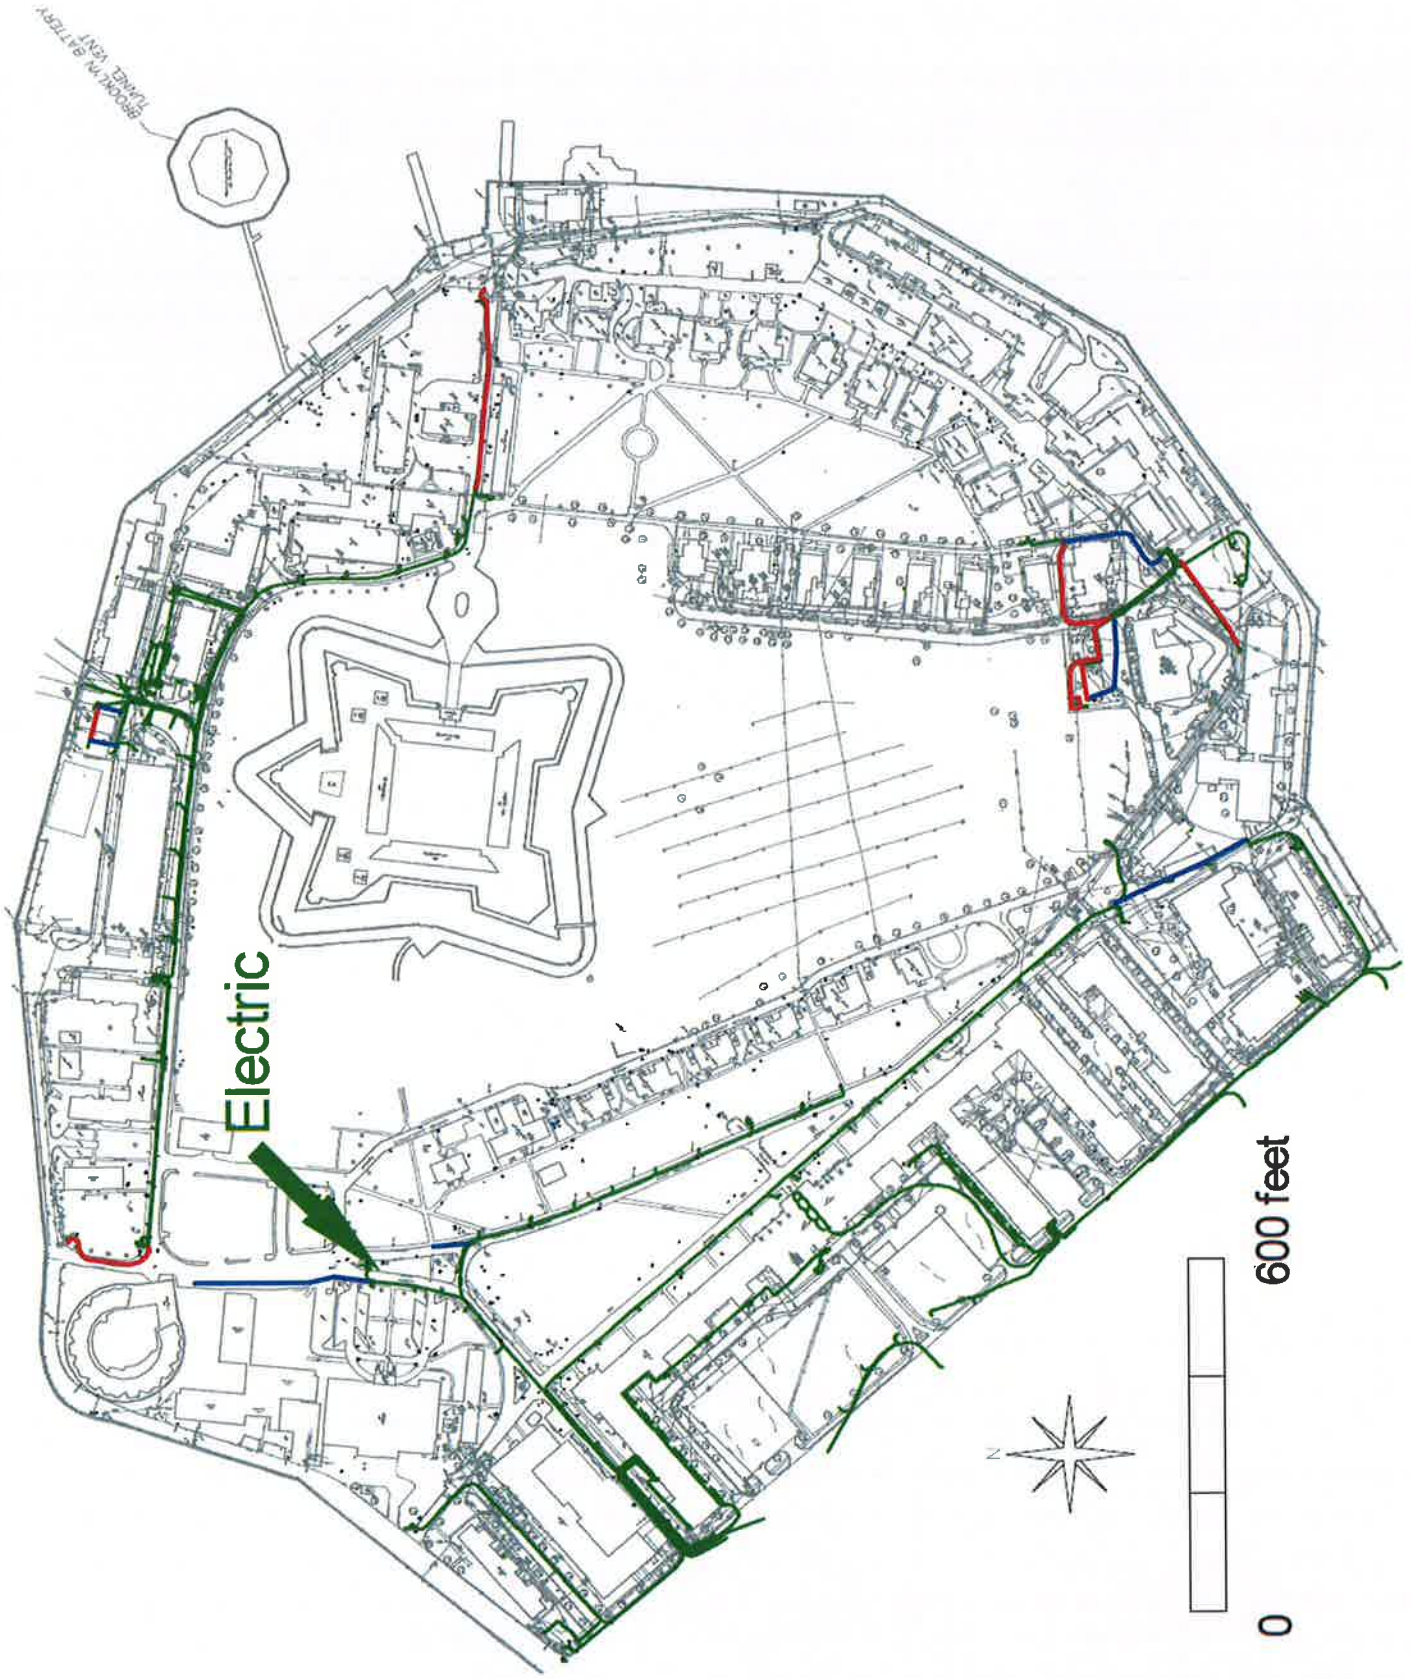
Overview of the electrical lines from the Governors Island Park and Public Space Project: Phase 1 final conformed set of construction drawings with red highlighting deletions and blue locations of additions to these plans.
